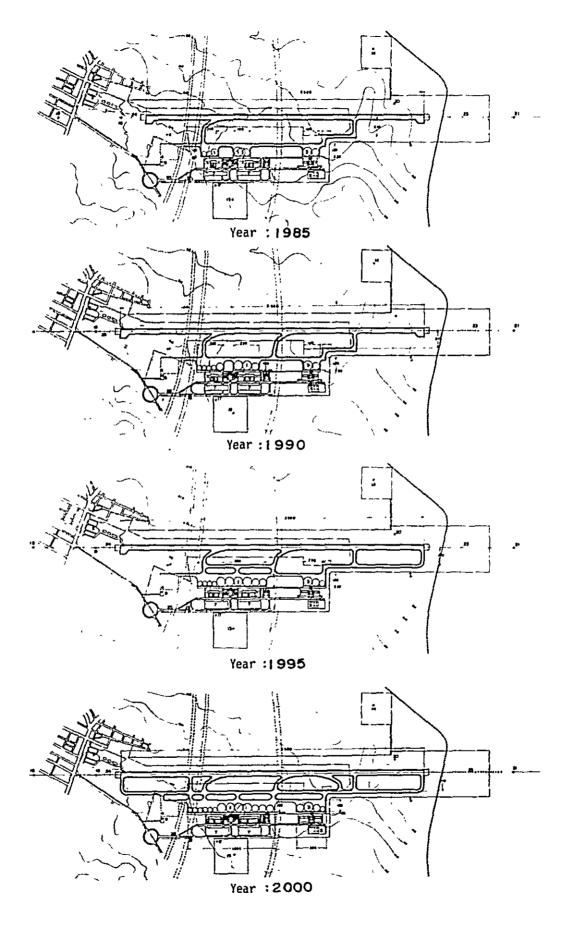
Facility Layout of El Trompillo Airport Expansion Plan
